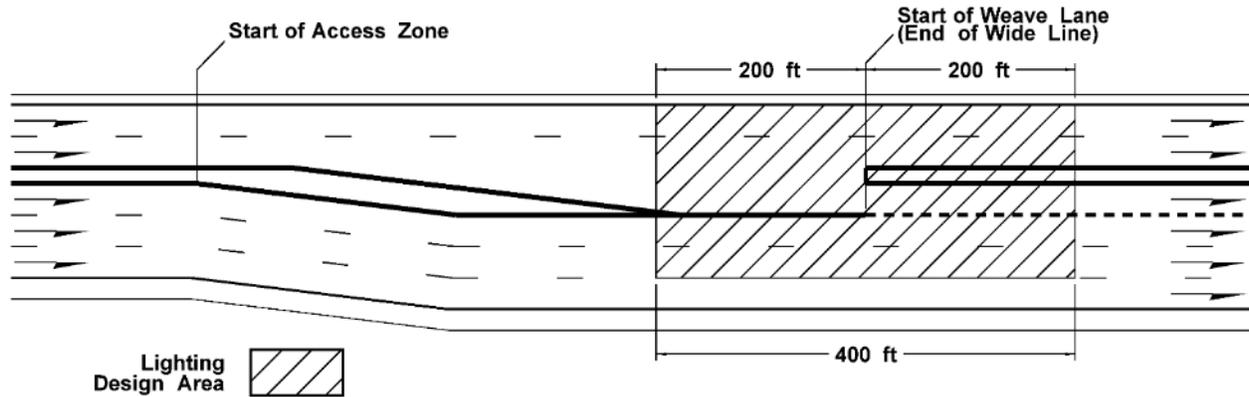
Special Use Lane – Basic Access Zone Lighting Design Area
